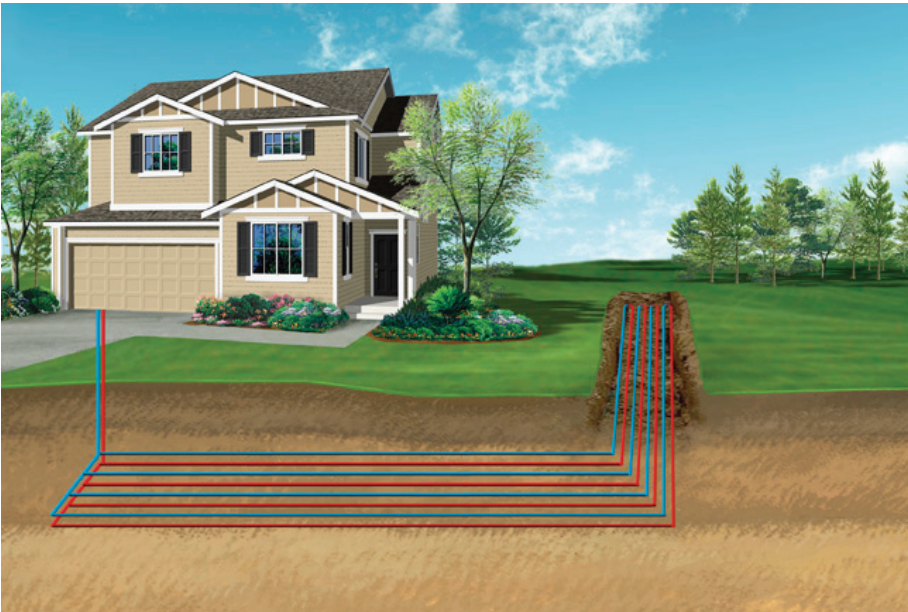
A horizontal loop geothermal system. Loop installers use excavation equipment such as chain trenchers, backhoes and track hoes to dig trenches approximately 6-8 feet deep. Trench lengths range from 100 to 300 feet, depending on the loop design and application.
